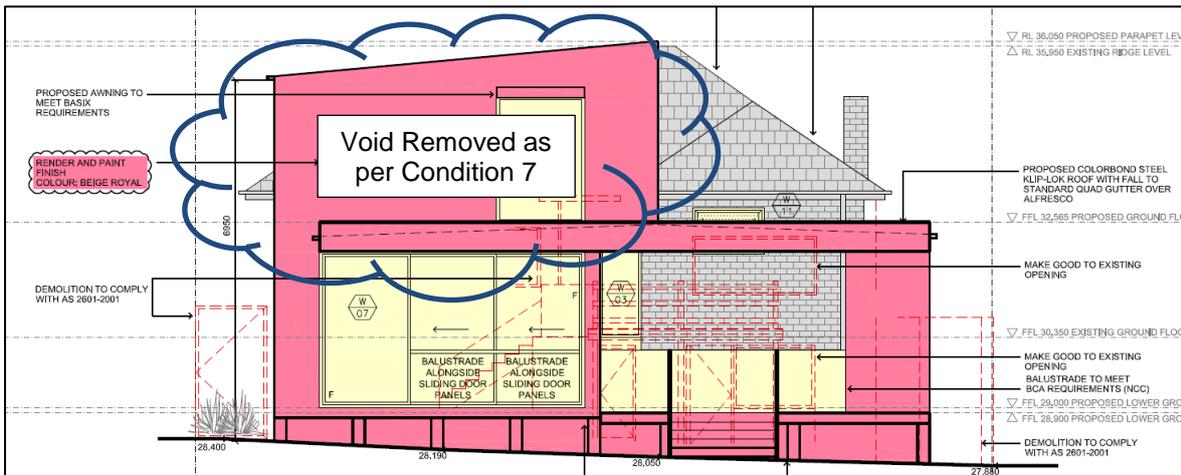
Proposed Eastern (Rear) Elevation (modification in pink)
